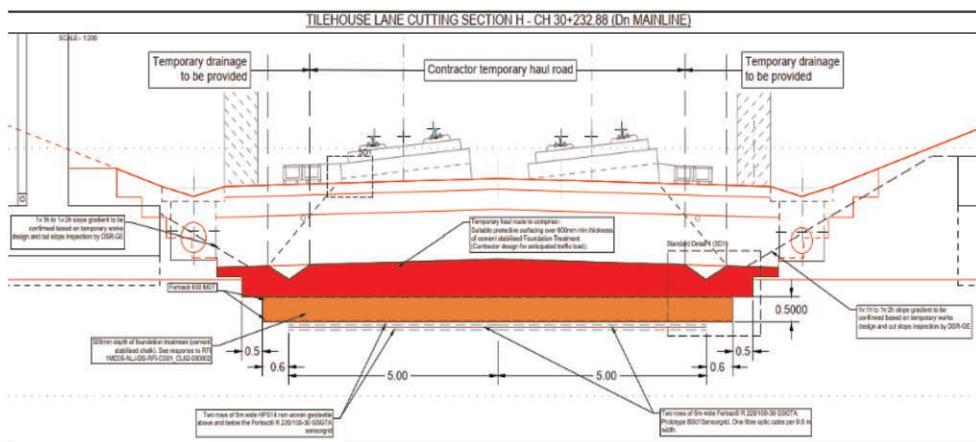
Cross section through construction haul road/mainline at Tilehouse Lane Cutting.
